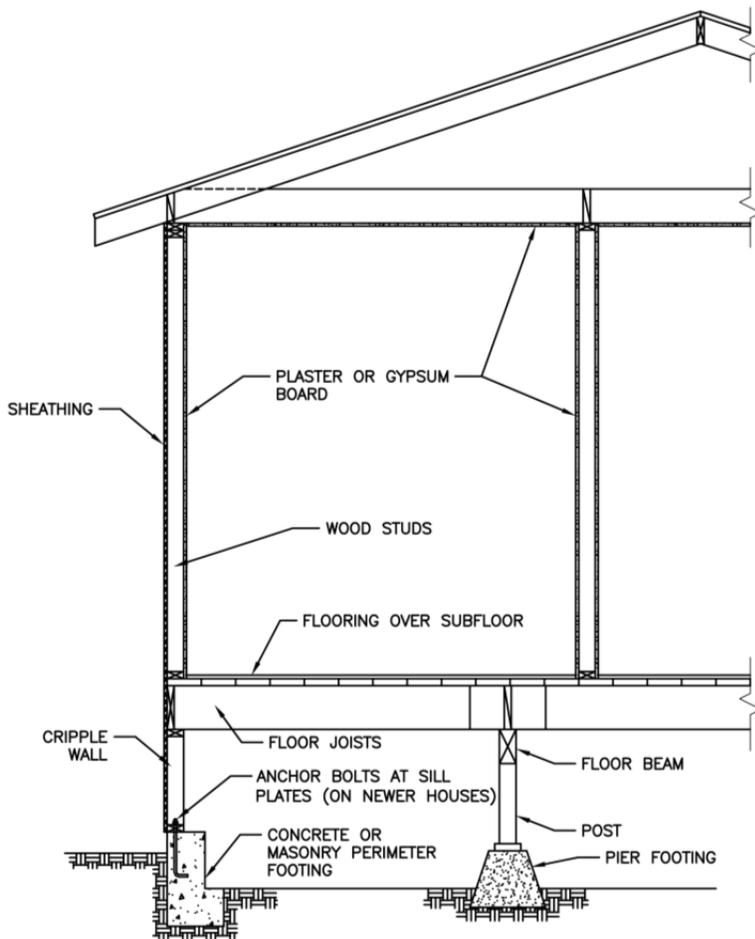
Section through typical cripple-wall crawl-space house (from ATC, 2002).
